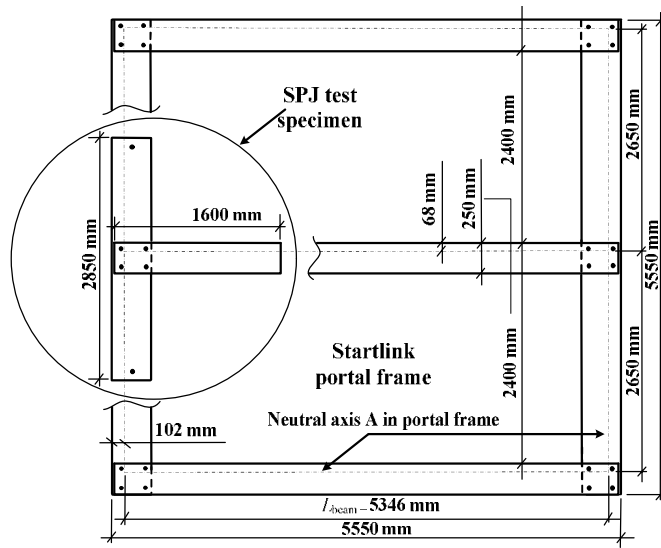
Startlink portal frame with specimen SPJ for external frame joint at first floor level.
